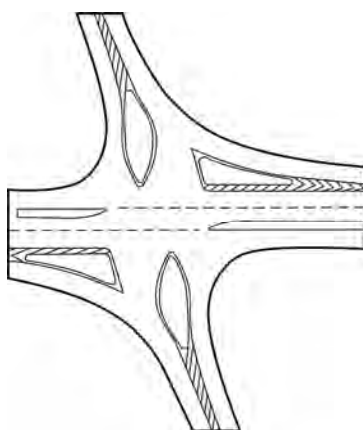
Example layout of a splitter island at a 4-legged intersection
